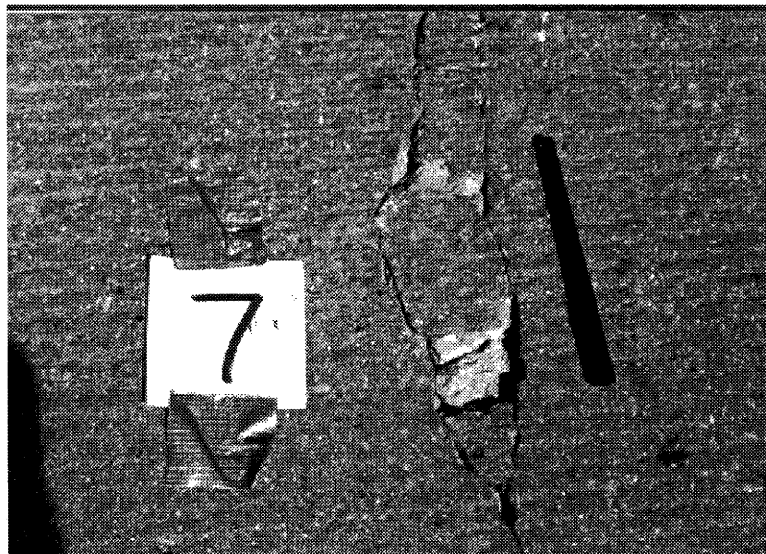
Longitudinal Deck Cracking on FM 51 Overpass.
